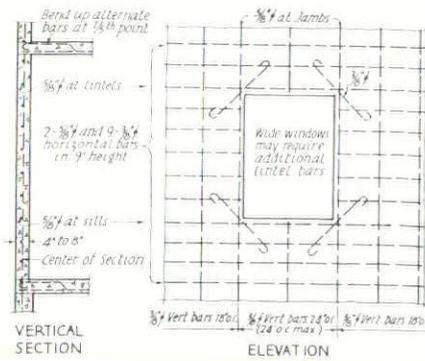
Reinforcement in solid concrete walls. Diagonal bars are effective in preventing cracking at openings, and should be used where wall thickness permits
